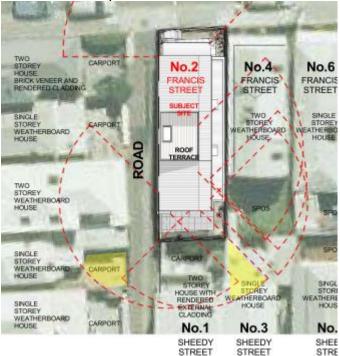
Overlooking diagram showing 9 metre radius from HRWs, Roof terrace and balcony (Applicant submission)
